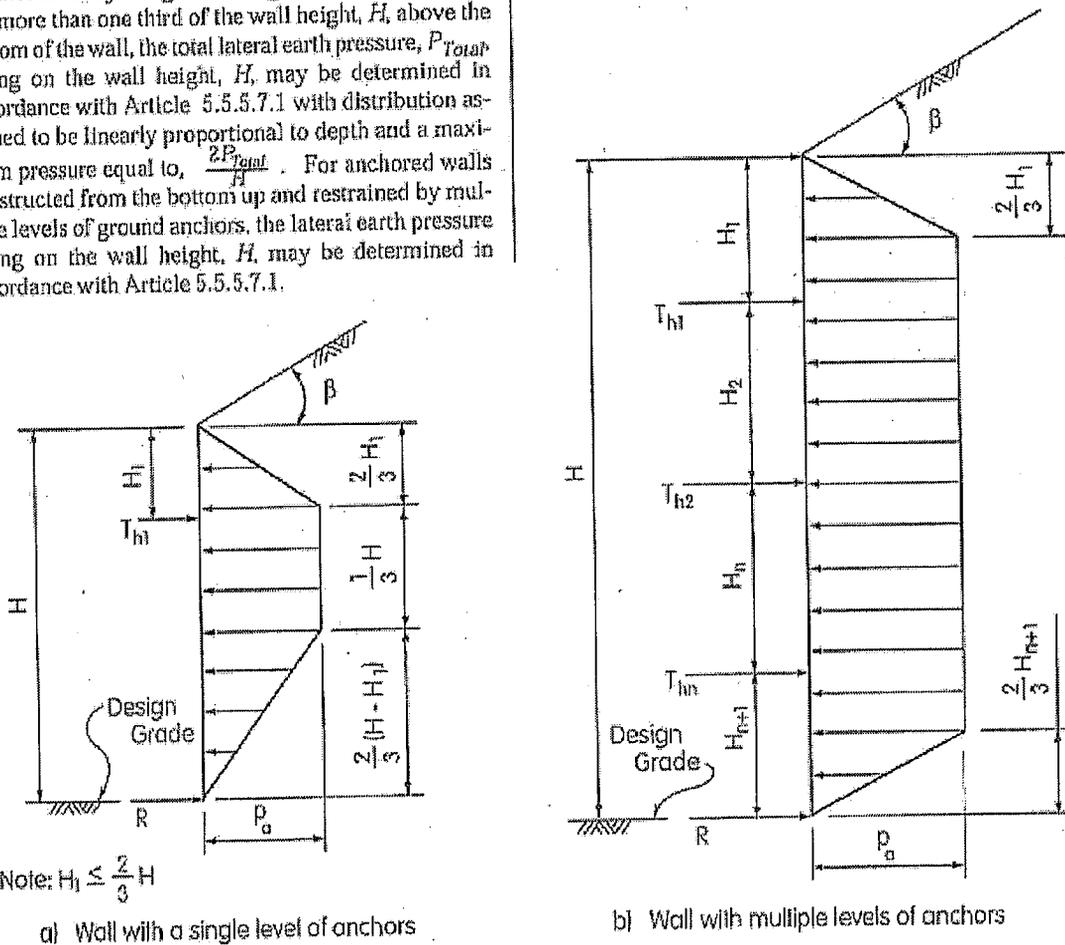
Lateral Earth Pressure Distributions for Anchored Walls Constructed from the Top Down in Cohesionless Soils
